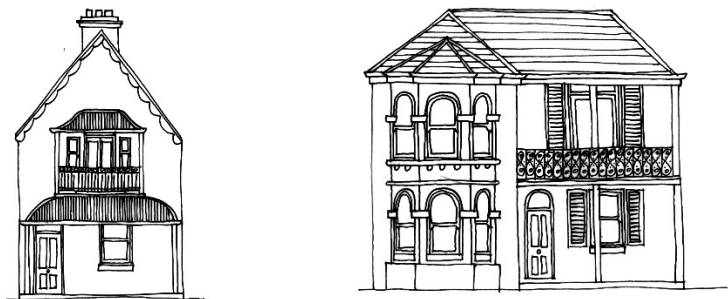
Design suggestions for rear additions to multi-storey dwelling houses
